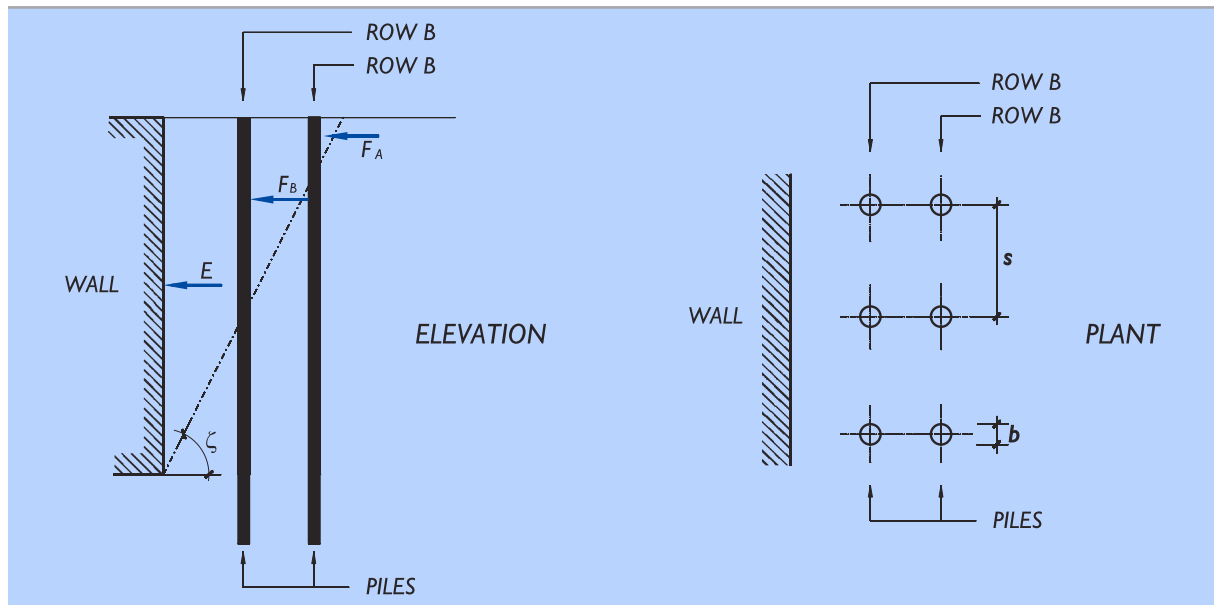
Earth Pressures on Piles in the Backfill of a Wall
